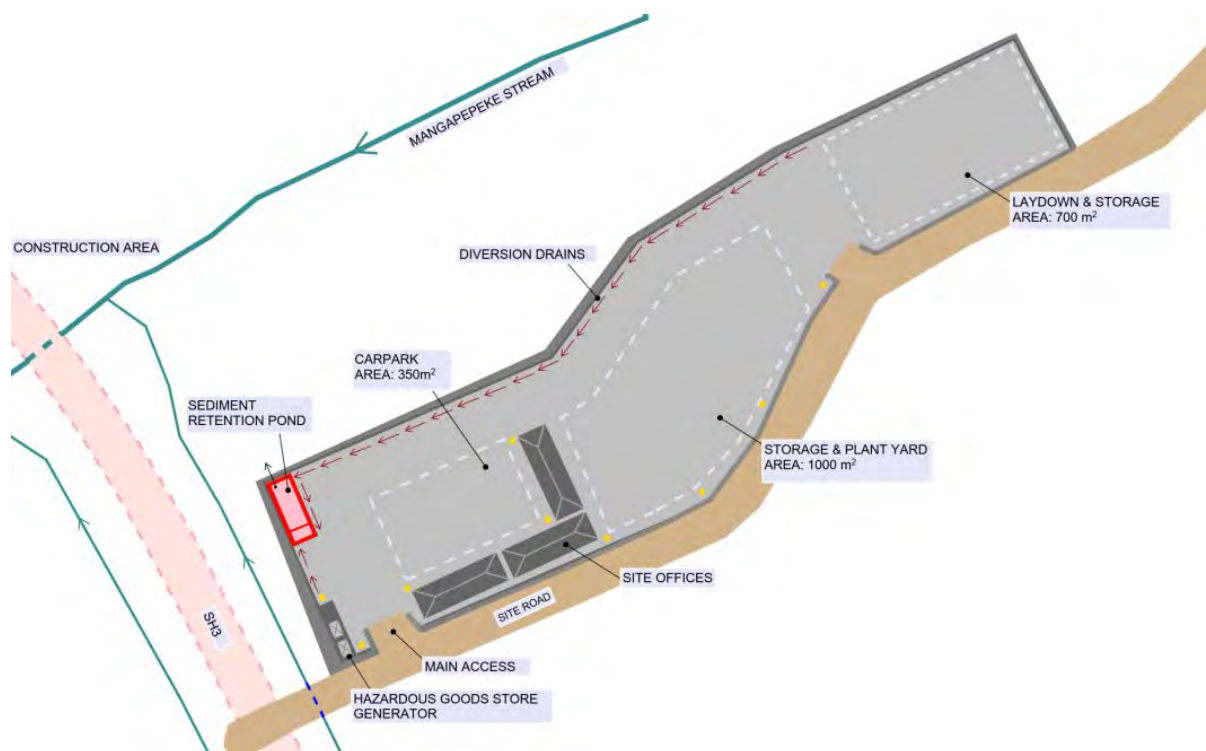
Main construction yard – indicative layout (refer to Volume 2 for full size drawing)
